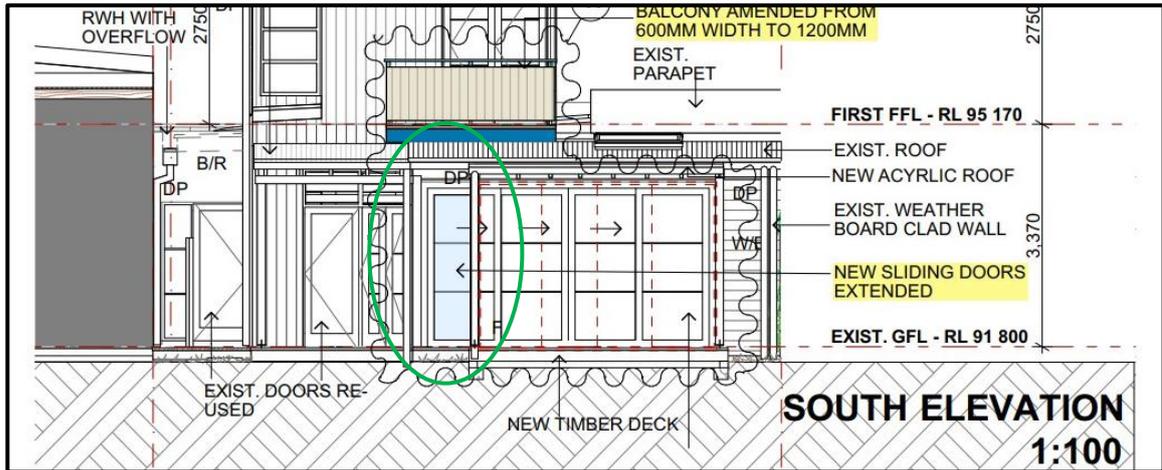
Proposed south elevation – additional sliding door incorporated in area (circled in green)
